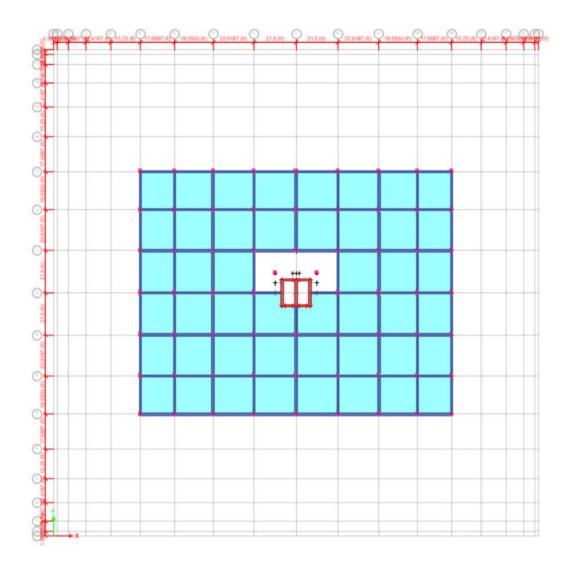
(f): 11th Floor Plan View of Non-Braced Structure
